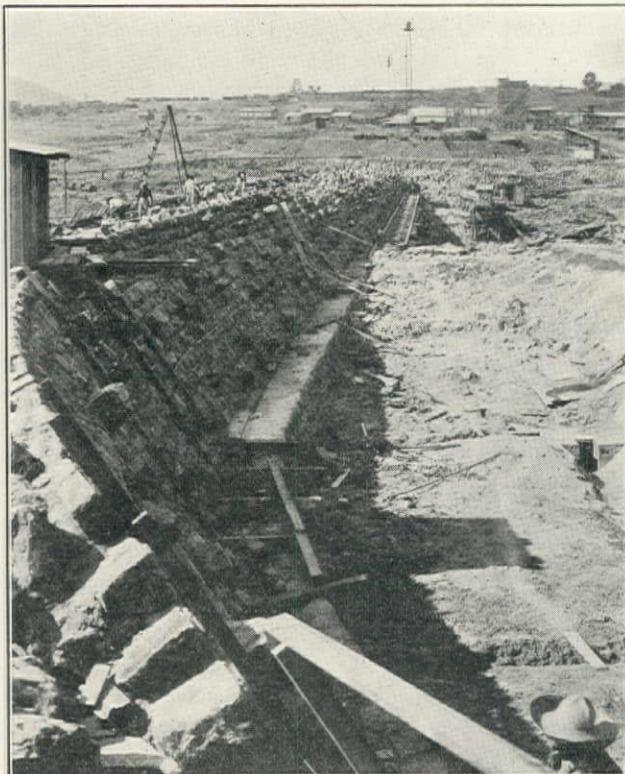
Downstream Face, Looking South. Rock Crushing and Concrete Mixing Plant in Background
